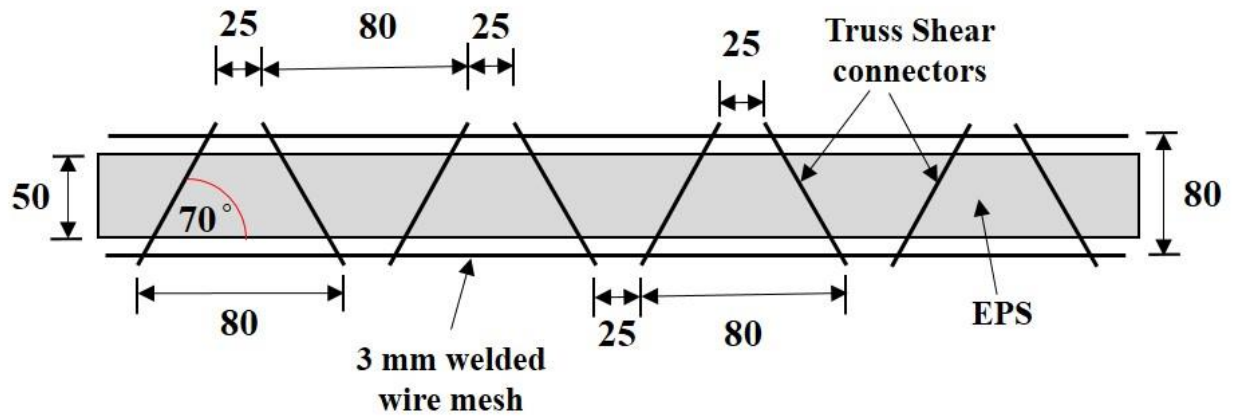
21: Detail dimension of truss shear connectors (all dimensions are in mm)
